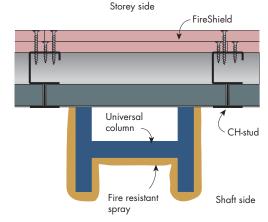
Shaft Wall Intersecting Column Detail
